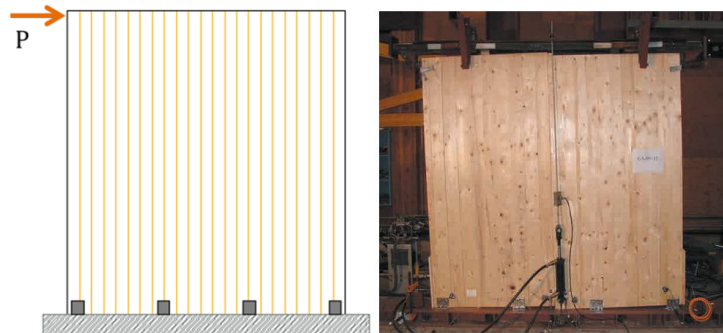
A schematic of CLT wall (left) and 2.3m X 2.3m wall specimen (right [8]).
